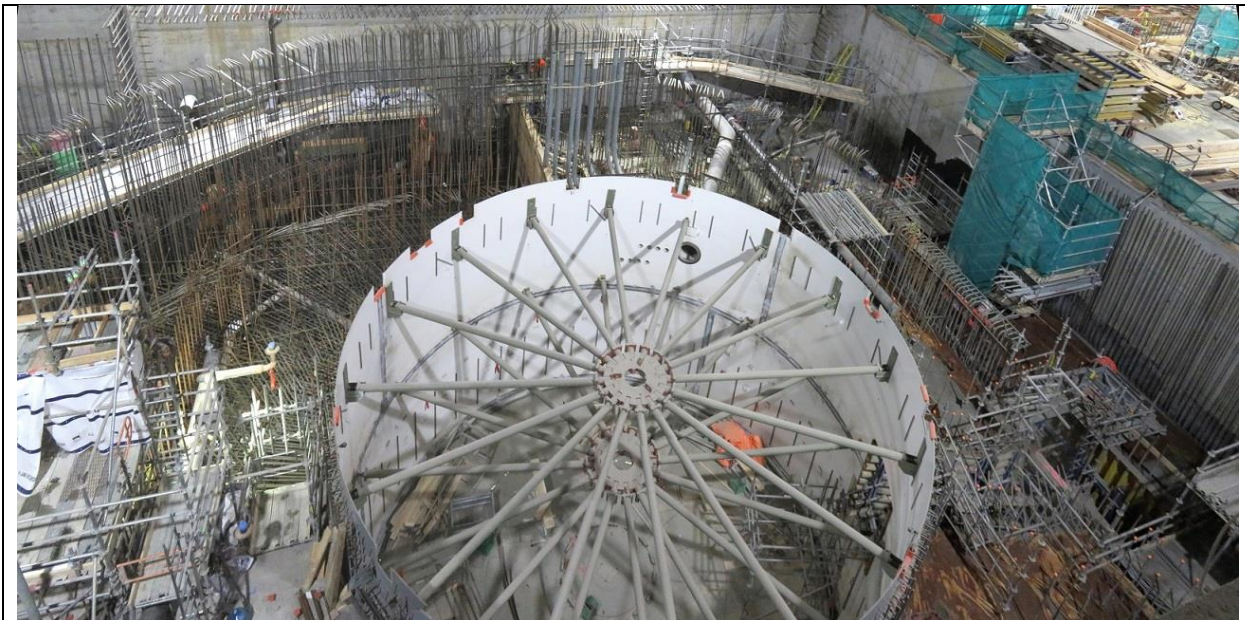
Installation of reinforcing steel and embedded piping in preparation for second stage concrete around pit liner in Unit 2.
